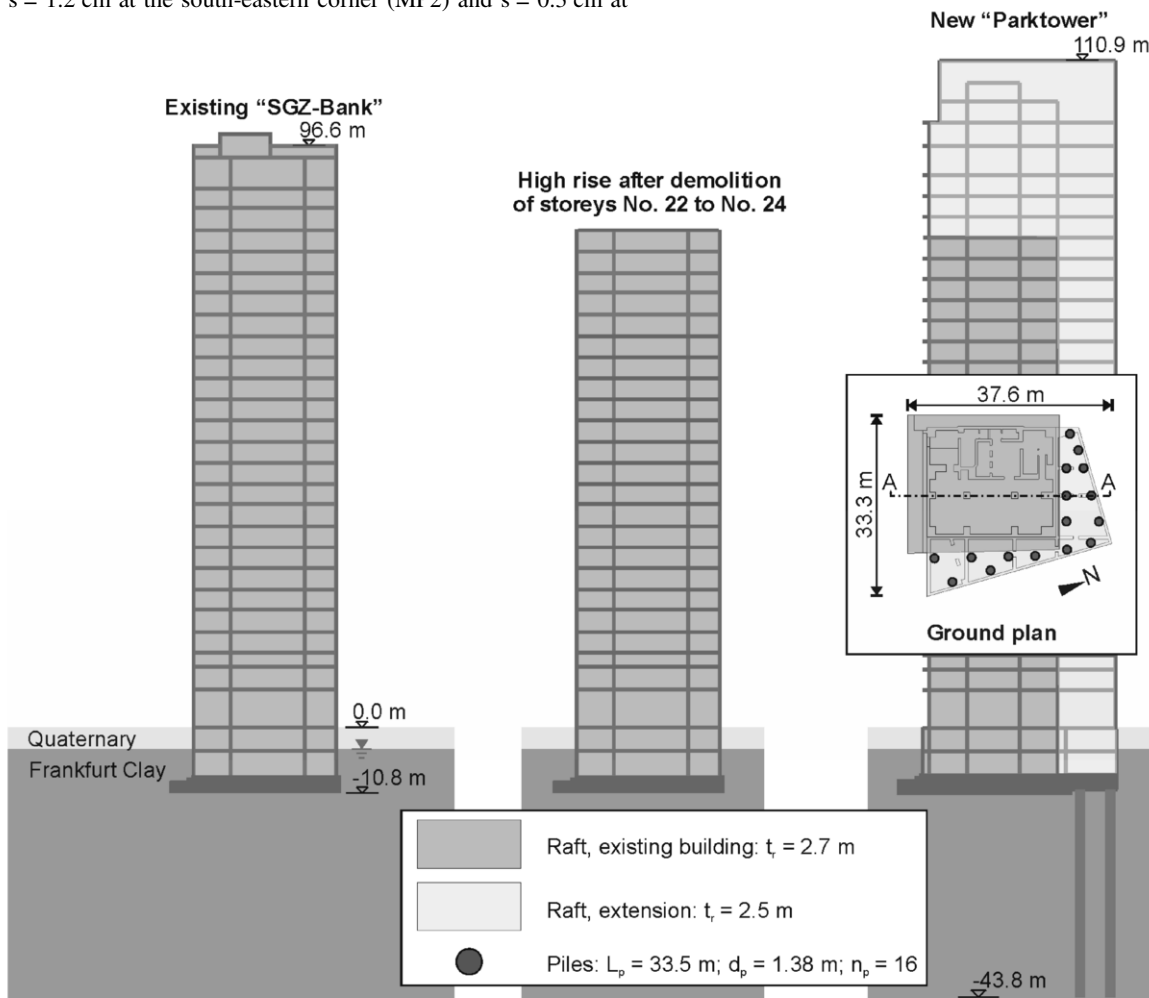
Cross-section and ground plan of the existing SGZ-Bank and the new Parktower
